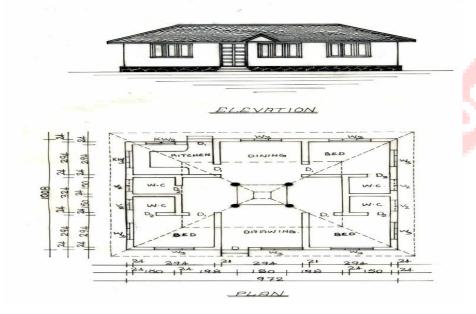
Elevation and Plan of a Traditional Nalukettu. Source: Adapted from Choyimanikandiyil,K. (2018).
